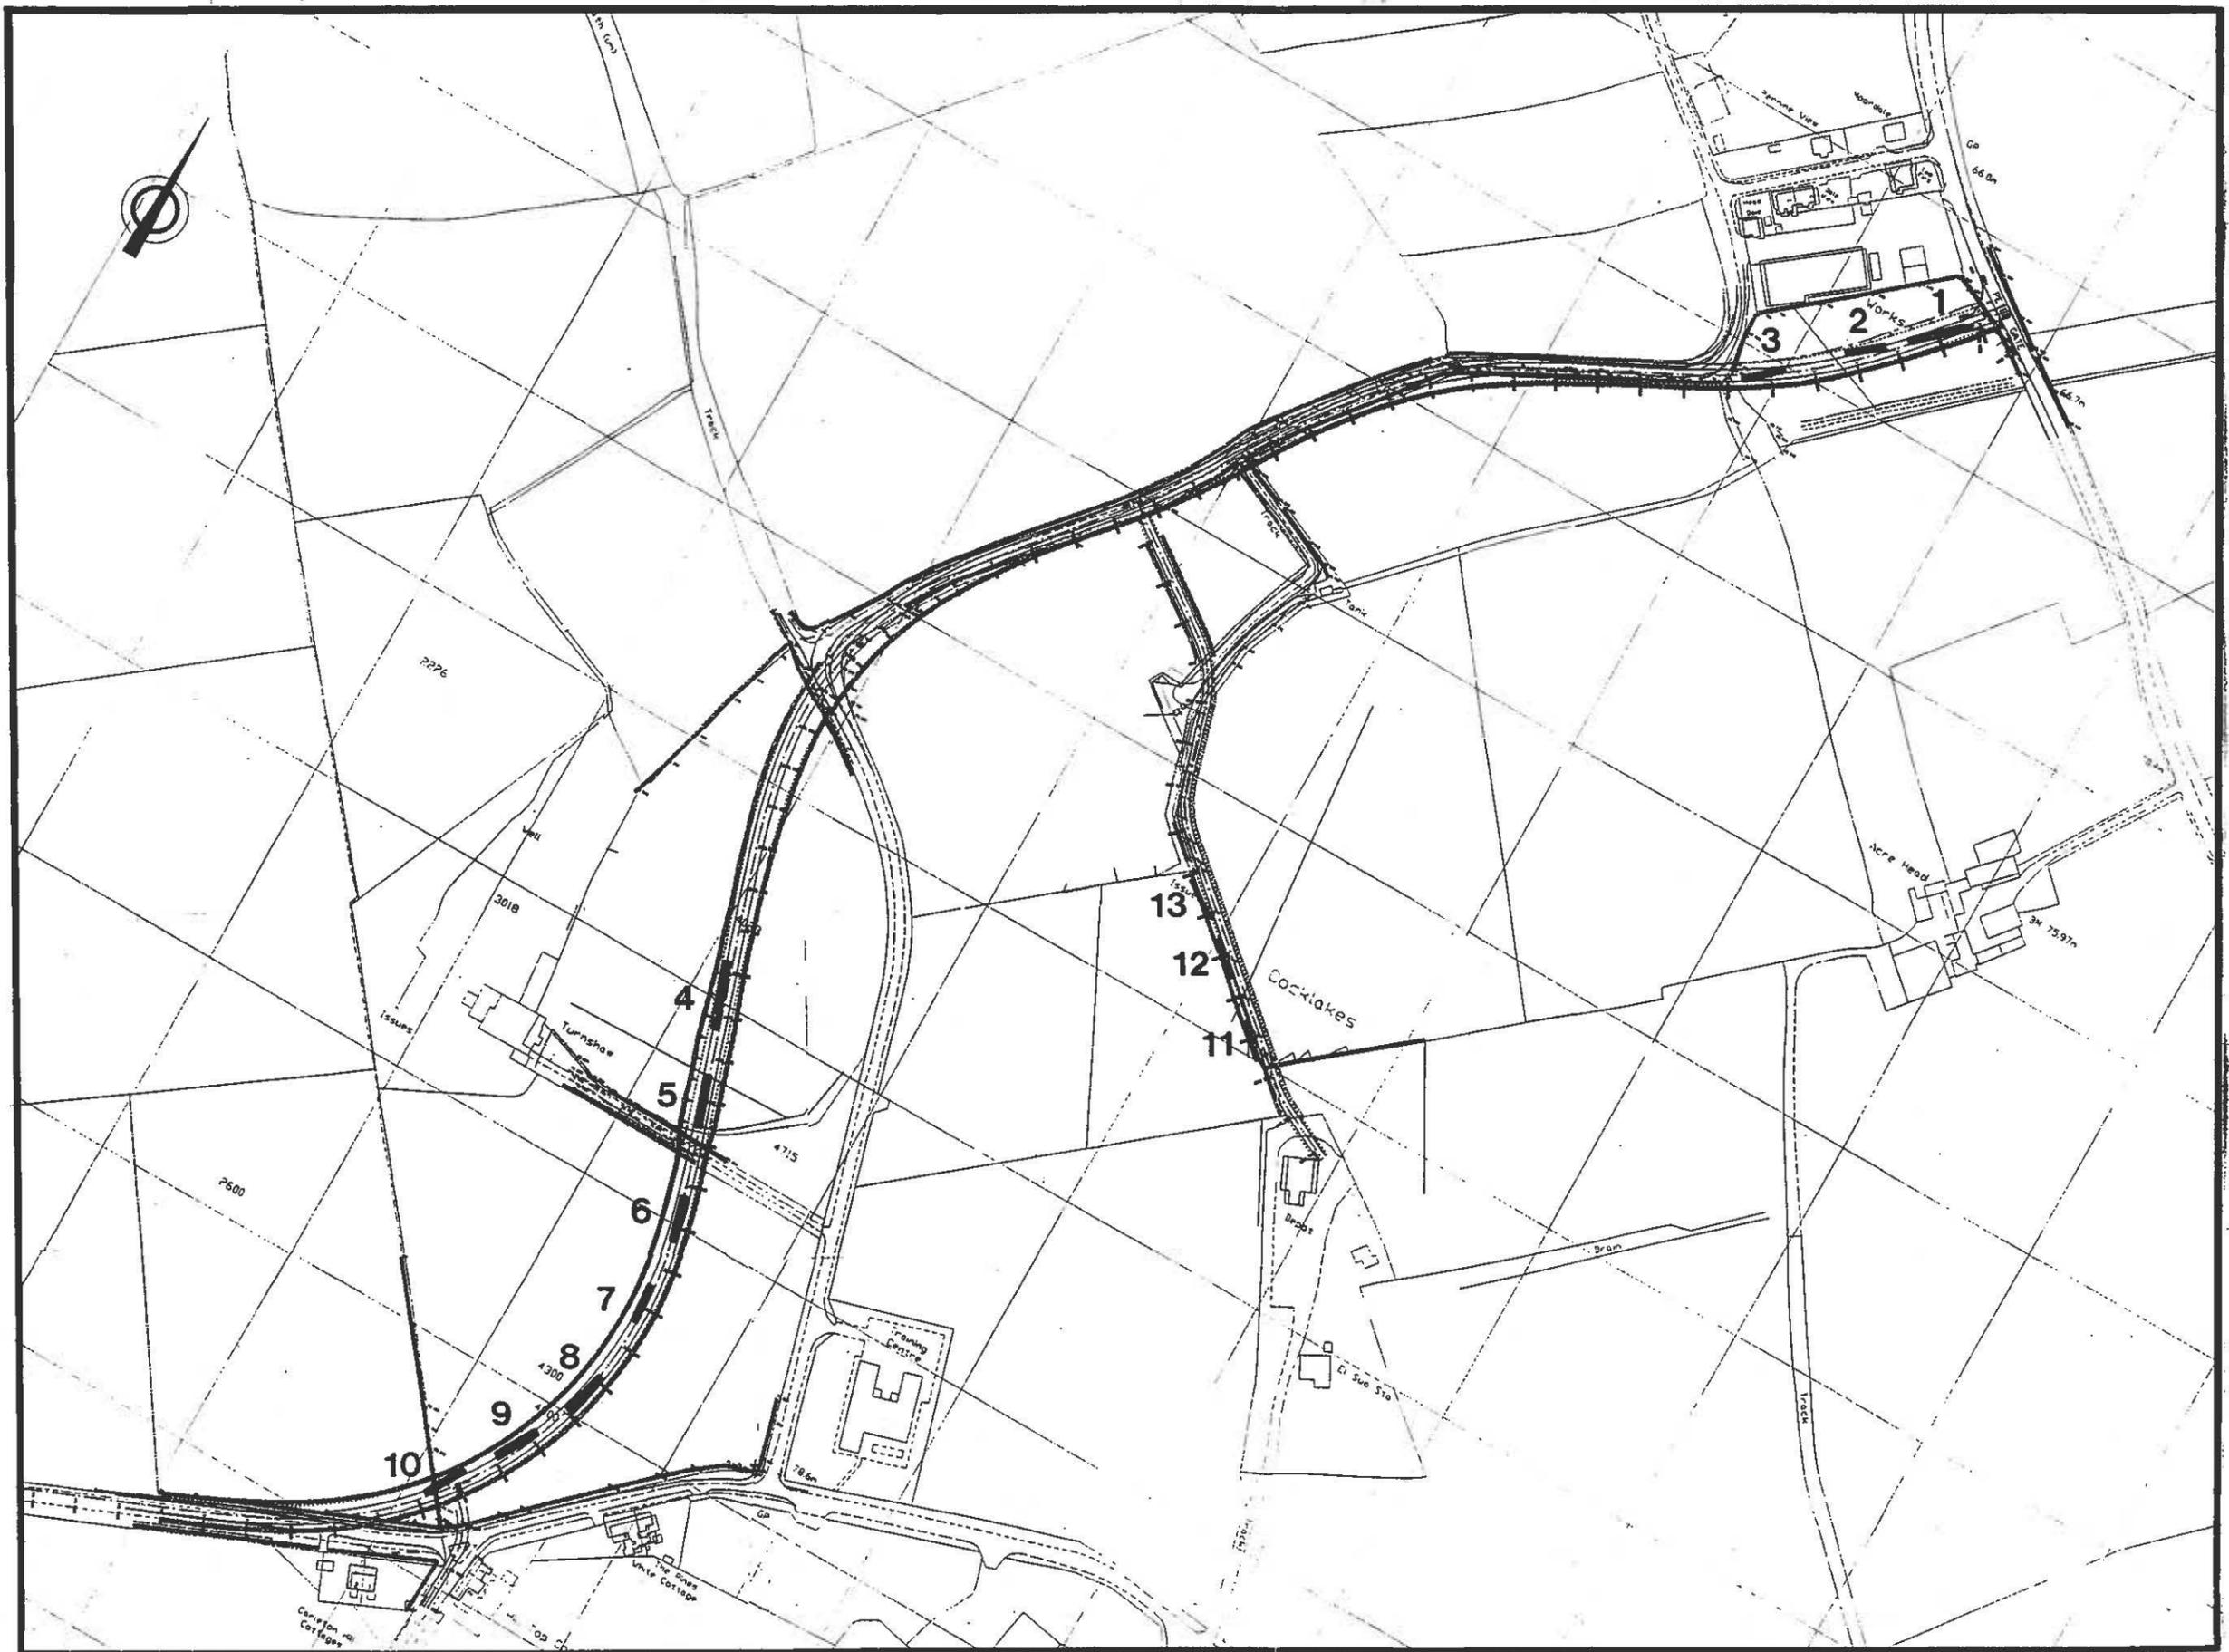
Cocklakes: plan showing the course of the proposed road and access track, and the location of the evaluation trenches (scale 1:3,000)
